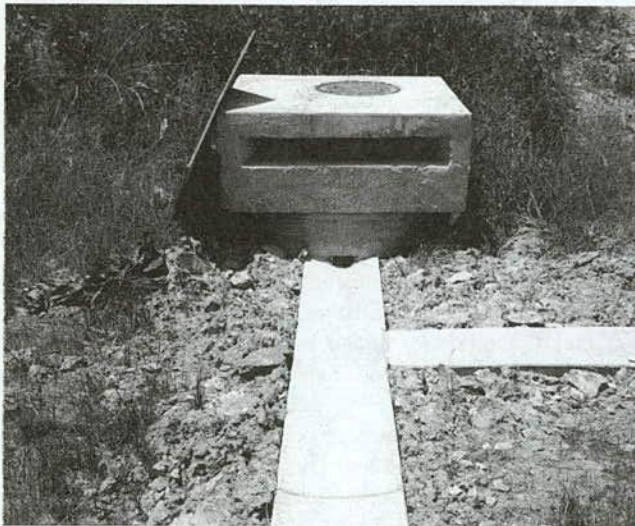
Extended dry pond outlet design (photo by R. Kaighn).
